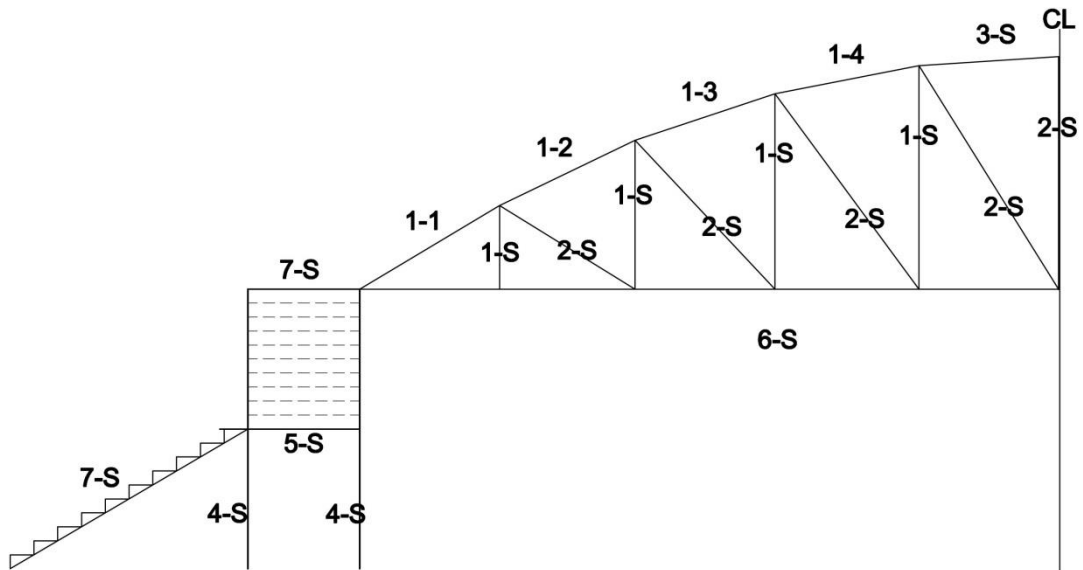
Section ID for elements of single span arch bridge with variable sections (A2)
